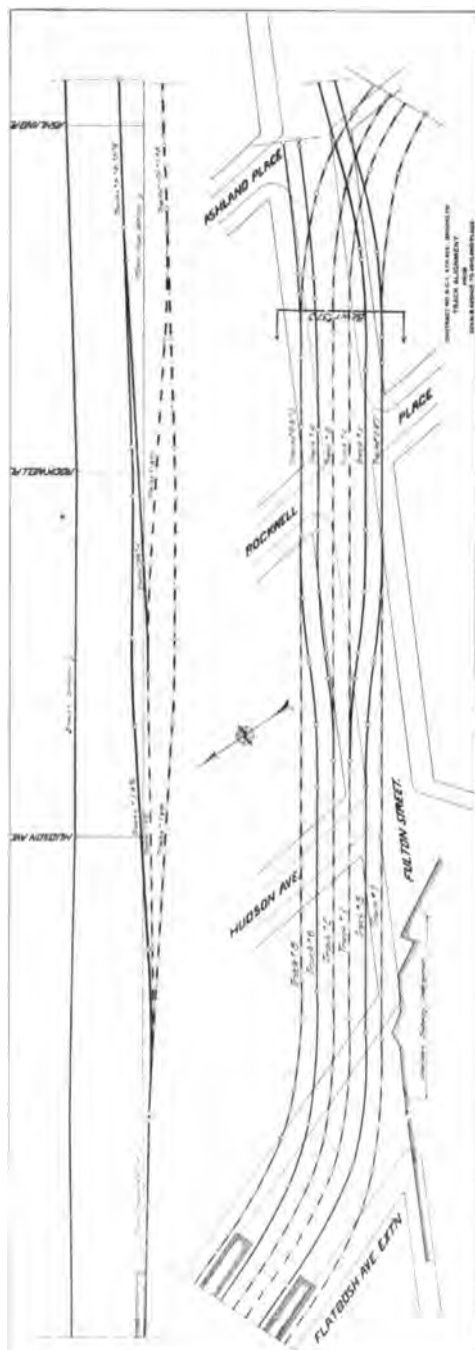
DIAGRAM OF TRACKS ON FULTON STREET.
